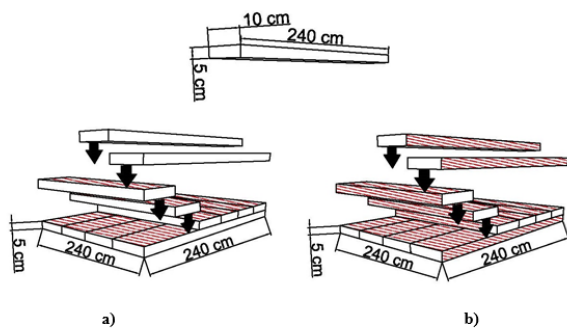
a) Non-edge gluing, b) Edge gluing (The shaded area shows the surfaces where gluing is applied).
